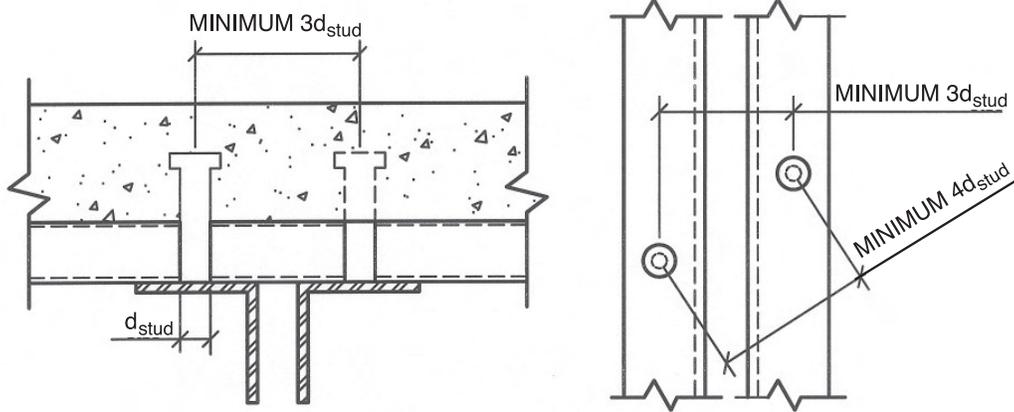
MINIMUM TRANSVERSE SHEAR STUD SPACING
